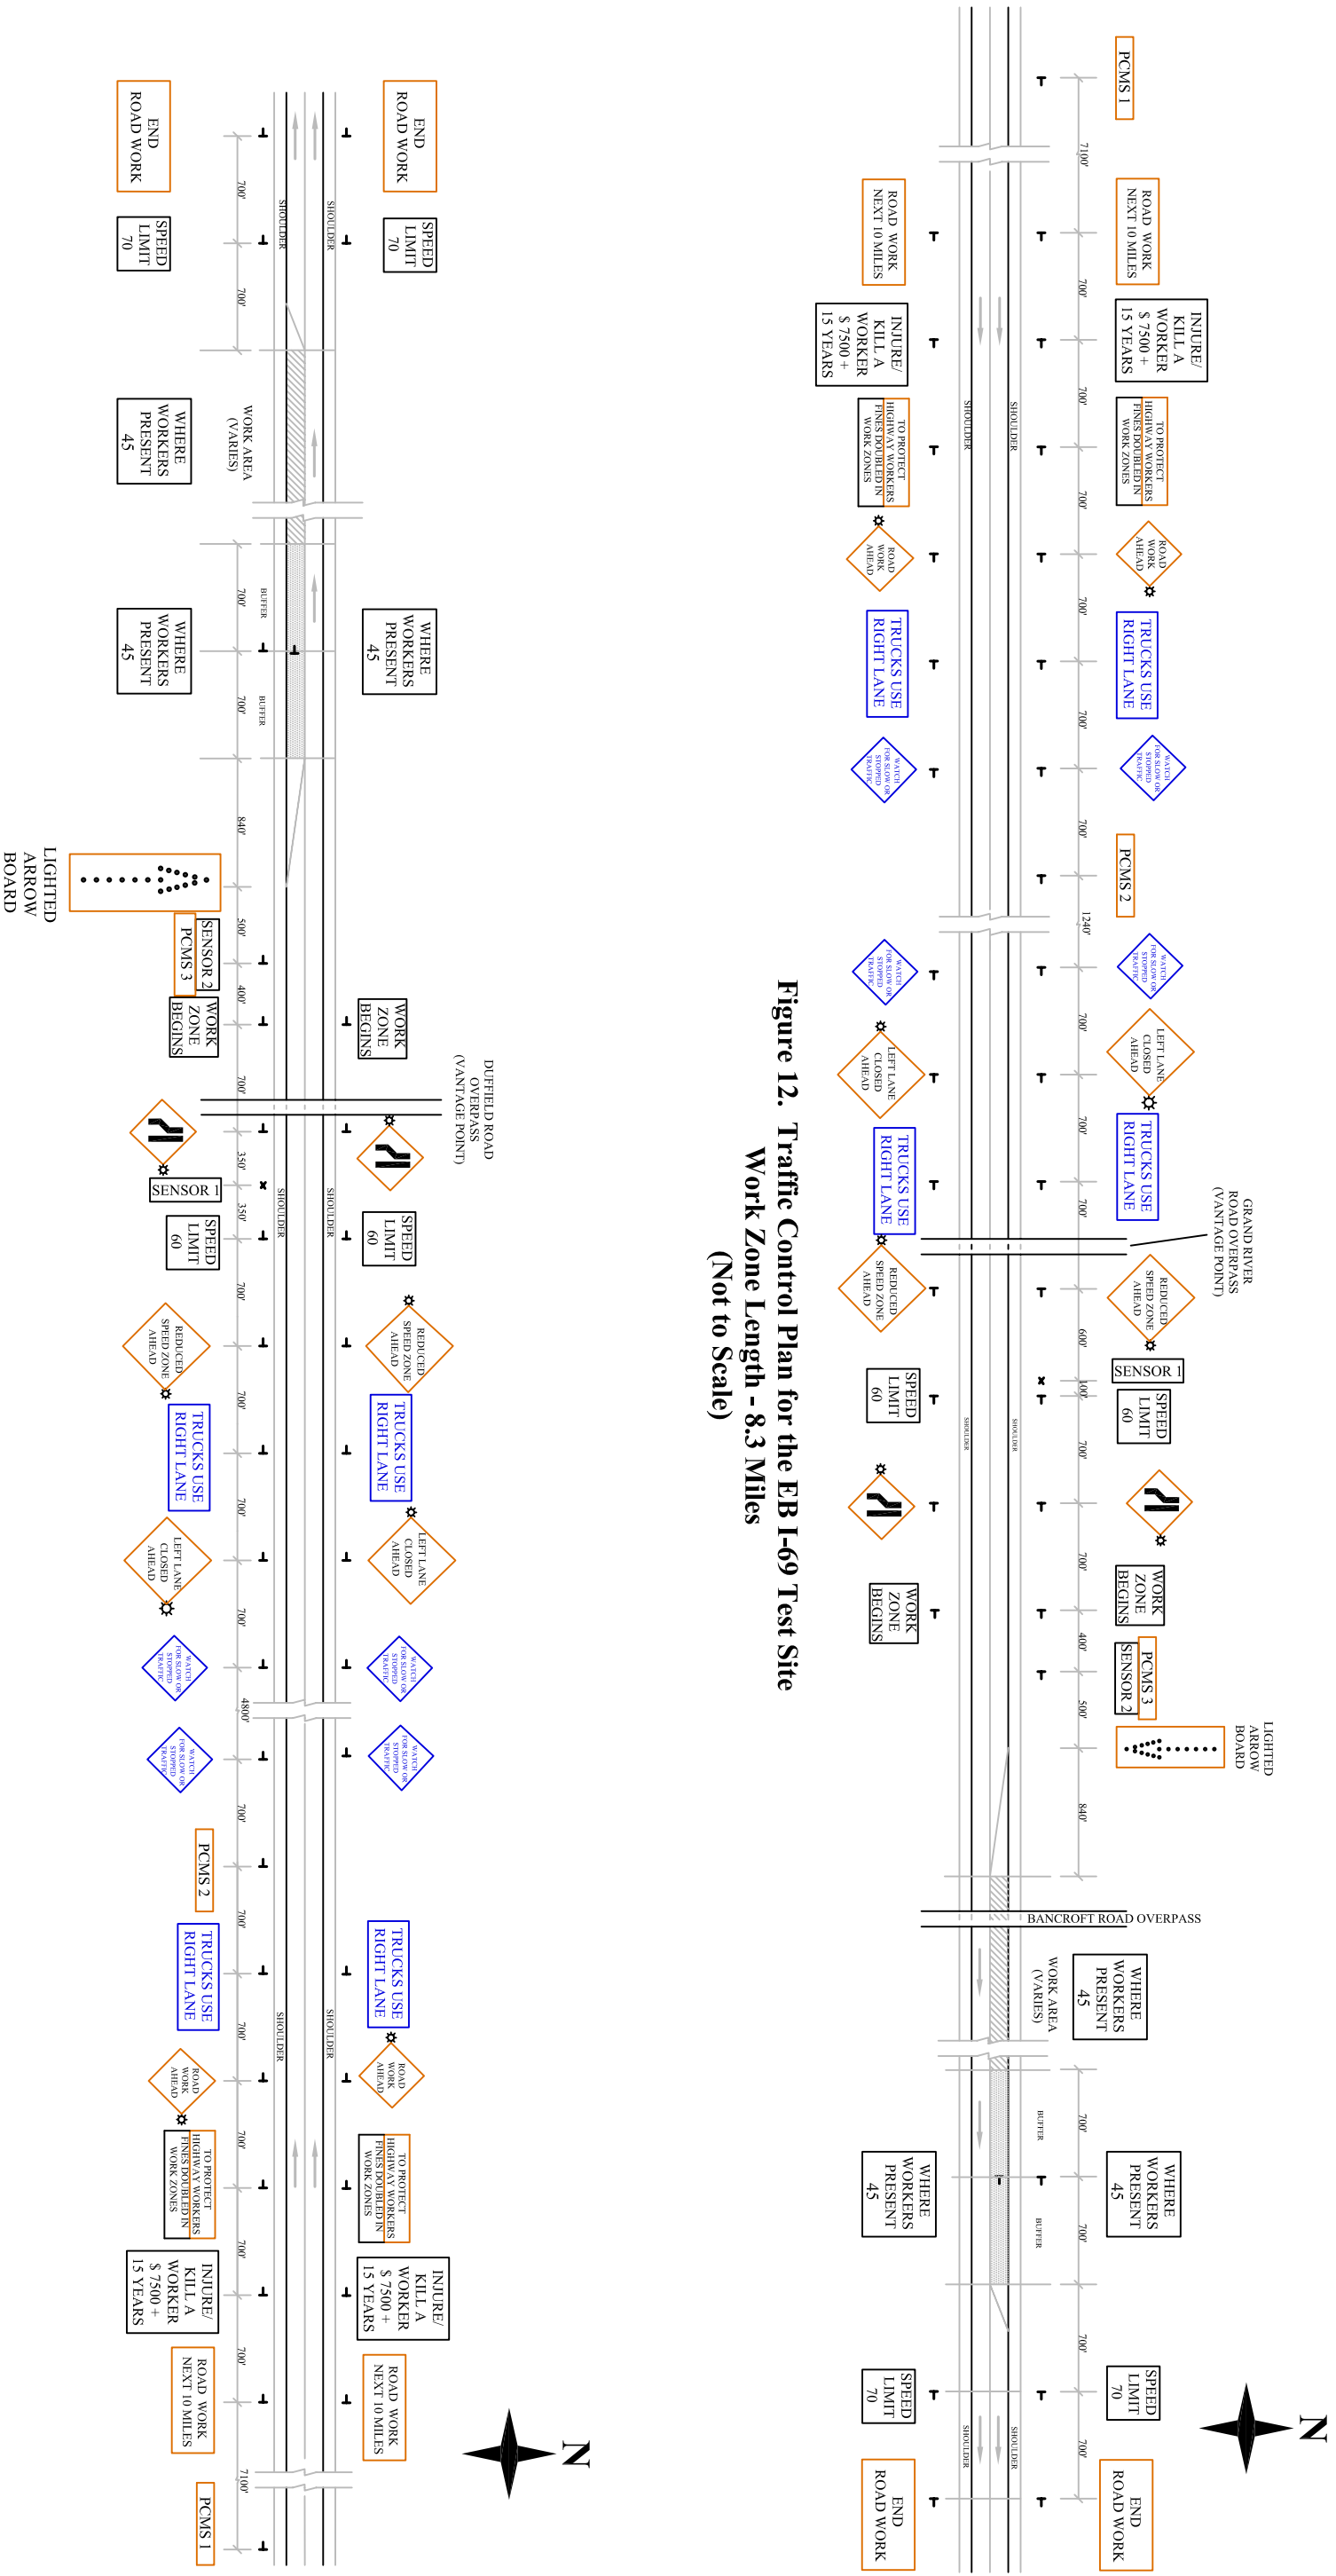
Traffic Control Plan for the EB I-69 Test Site
